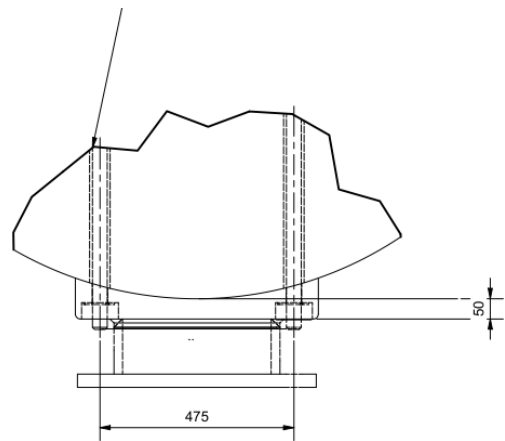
REINFORCEMENT CAGE INSTALLATION
